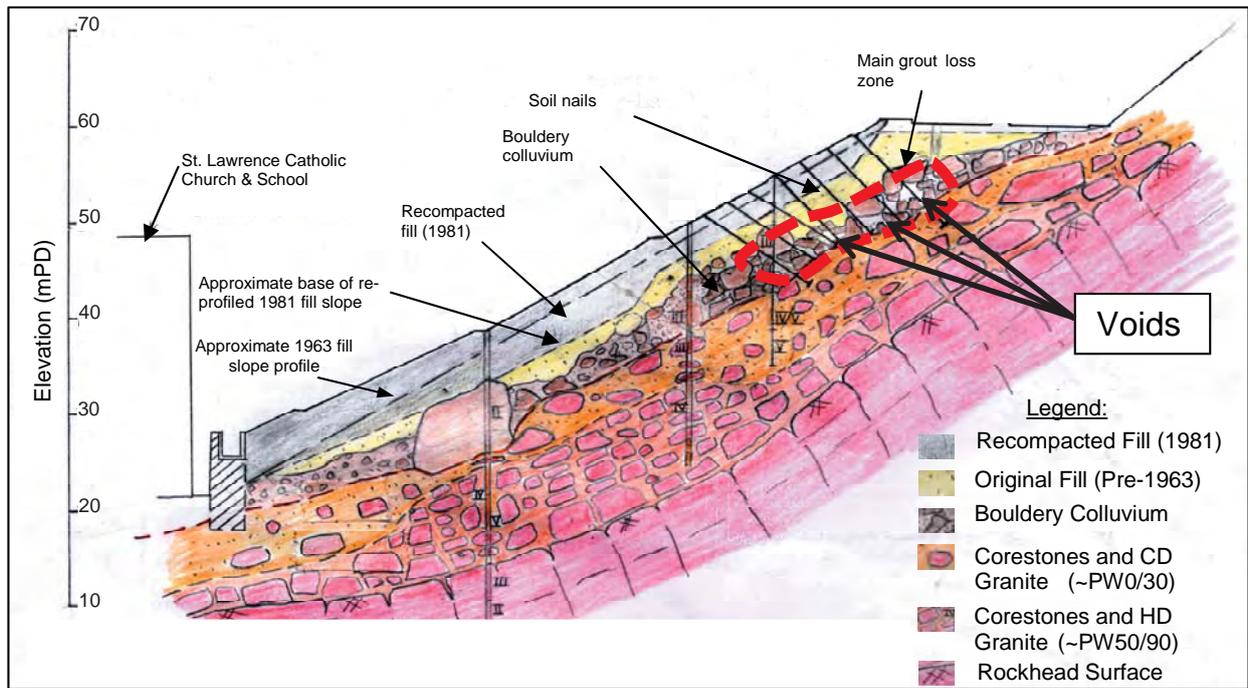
Cross-section through a fill slope below Tai Po Road showing location of soil nail grout loss zone
